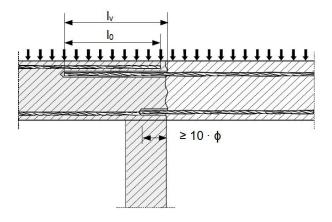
Overlapping joint with existing reinforcement of rebar connections of slabs and beams
